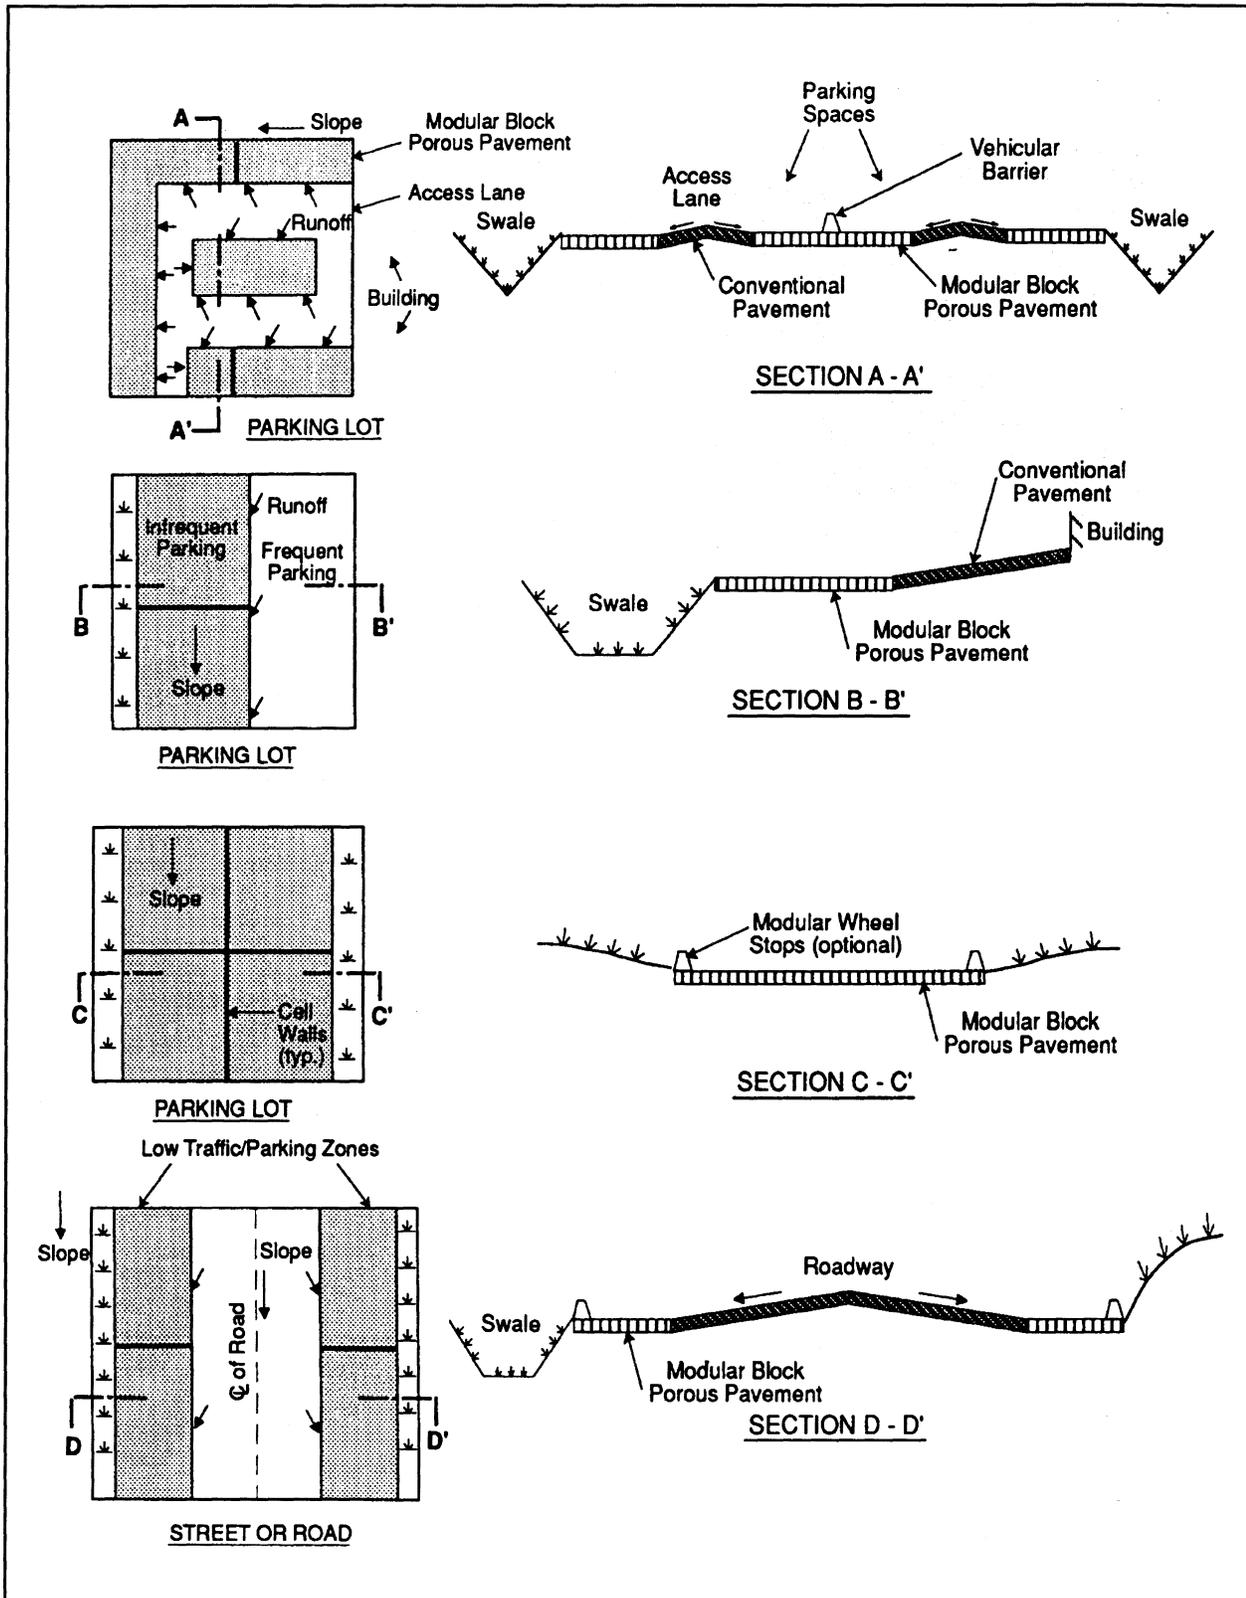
Typical applications of modular block porous pavement (not to scale) (Urban Drainage and Flood Control District, 1992)
